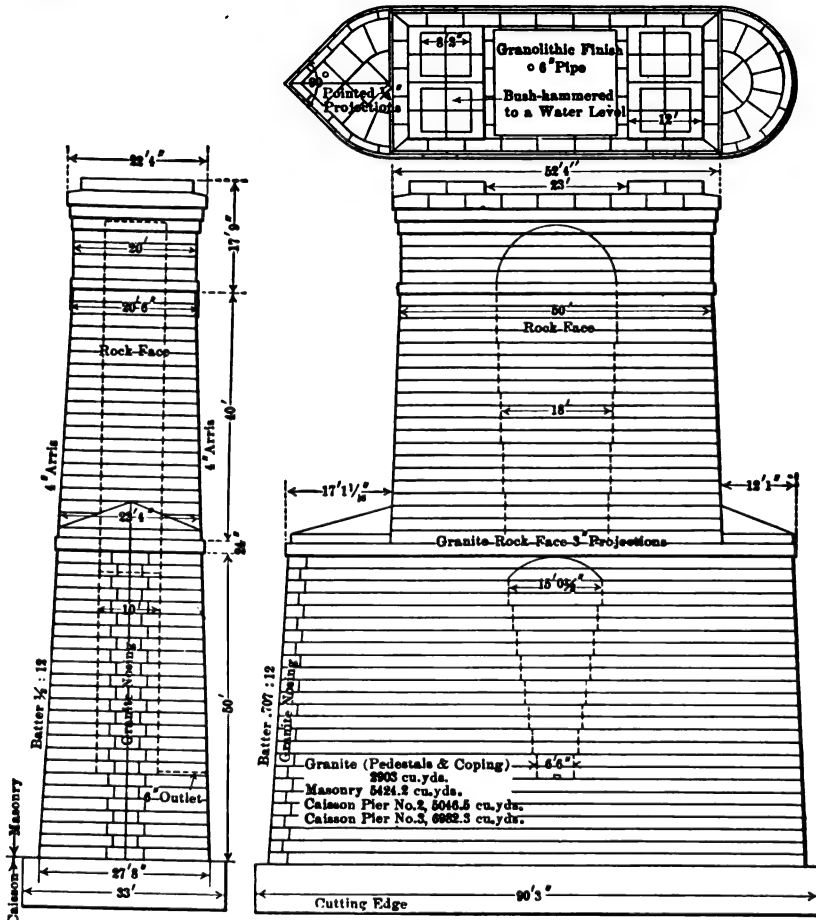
CHANNEL PIERS OF THE MUNICIPAL BRIDGE, ST. LOUIS, MO.
